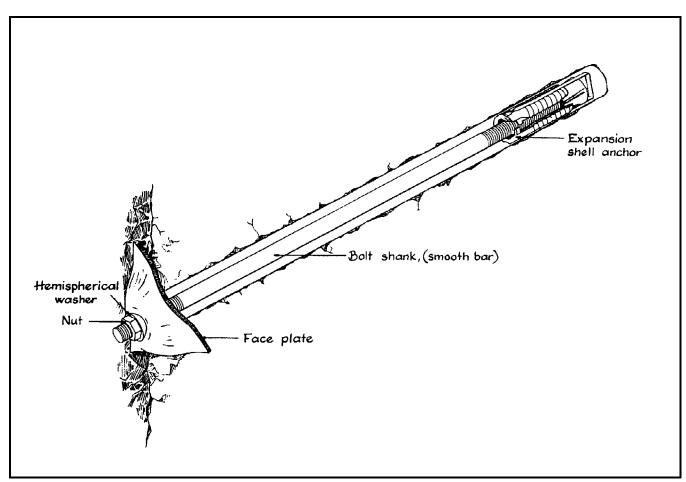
Mechanically anchored rock bolt—expansion shell anchor
